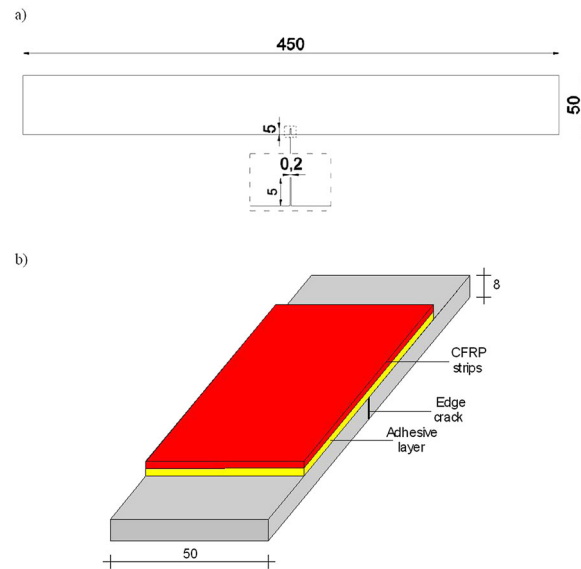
Single edge notched tension specimen geometry: (a) steel plate and (b) specimen reinforcement.
